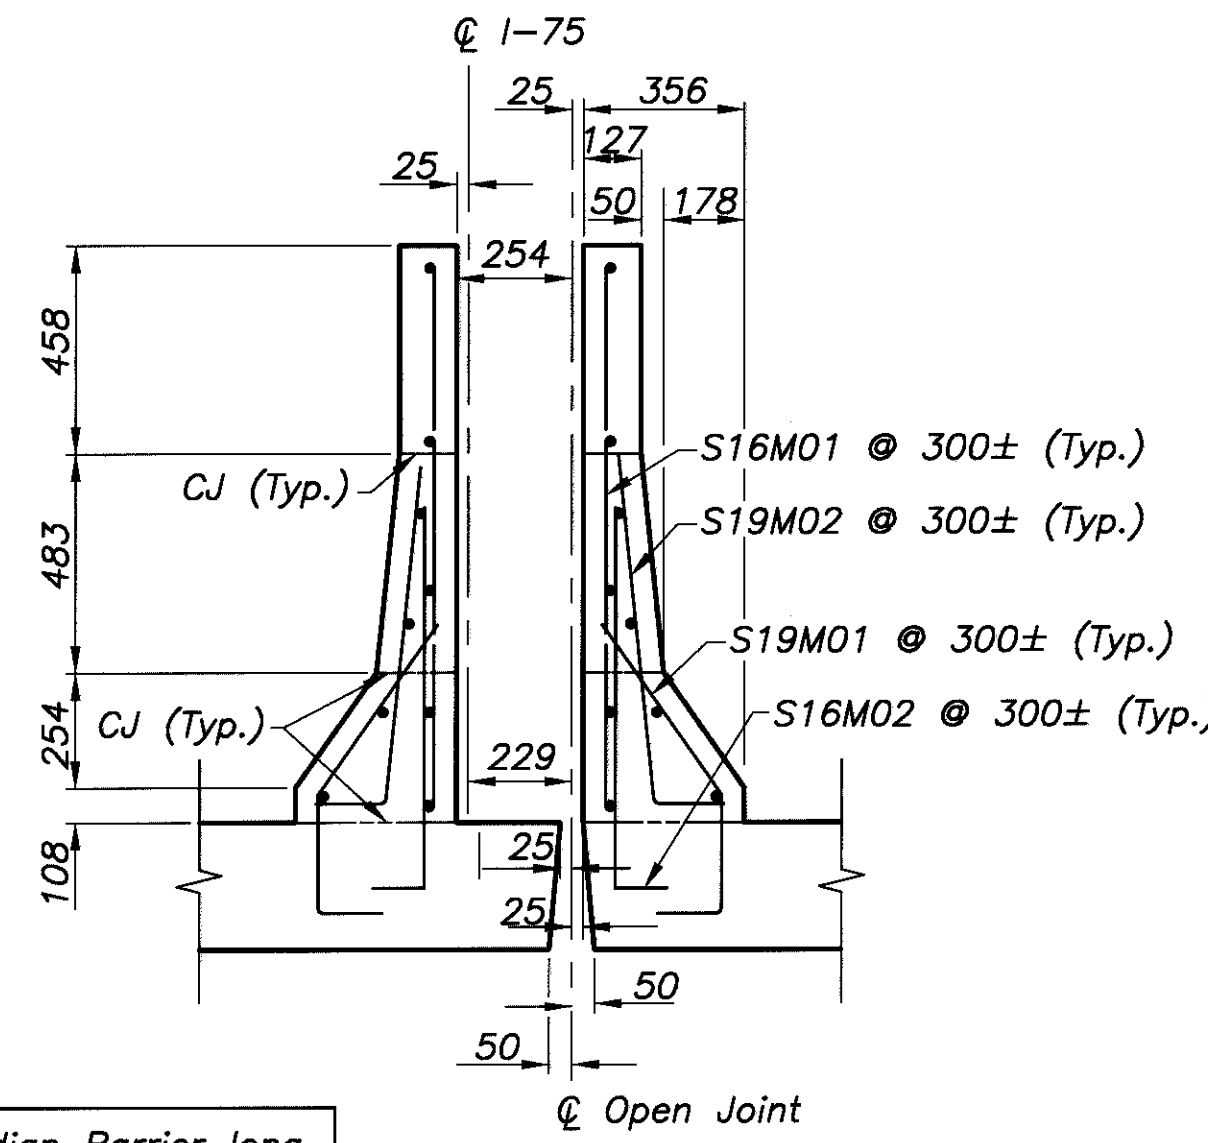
DETAILS FOR SLAB REPLACEMENT AT DECK JOINTS (CONTD.)
